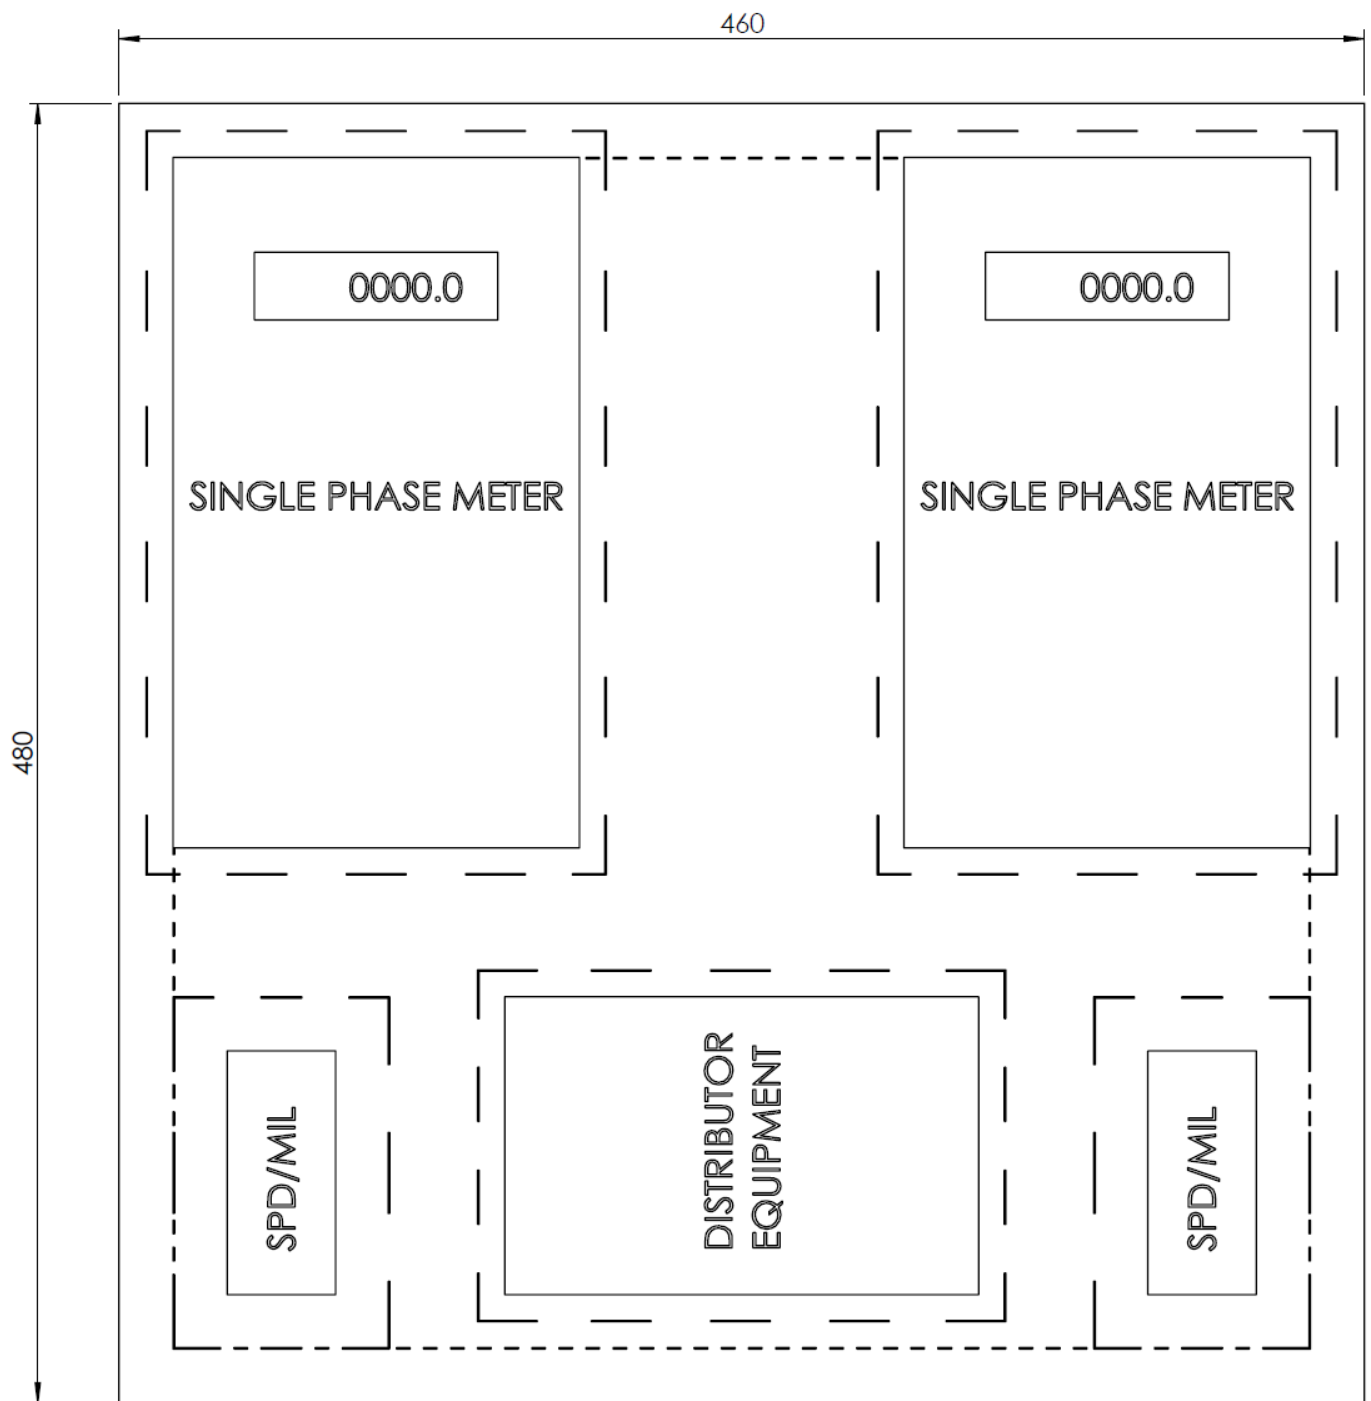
Typical Panel Layout for Residential House with two single phase meters and load control
